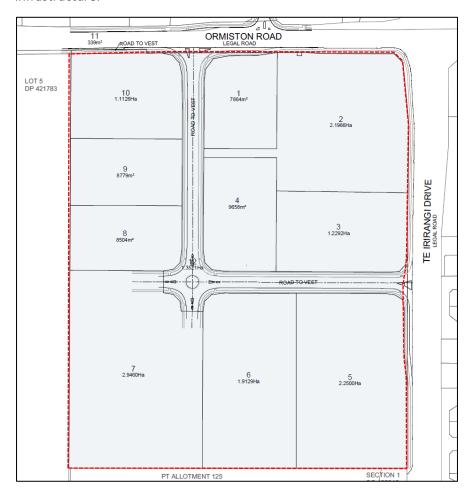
Site and Subdivision Plan (Site outline shown in red)
